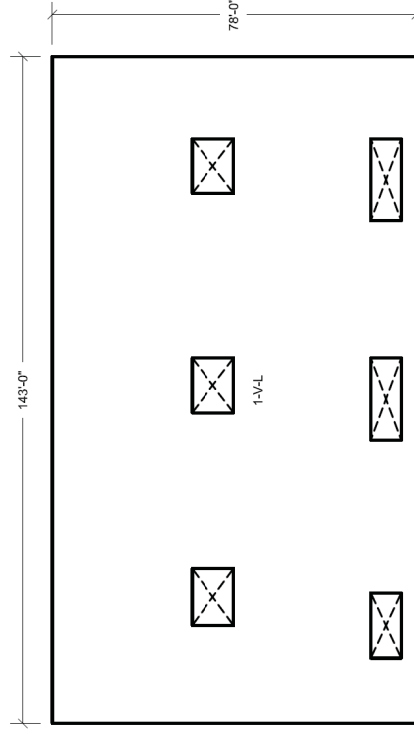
H-6-130: PUMP HOUSE FLOOR EL. 15'-2"
